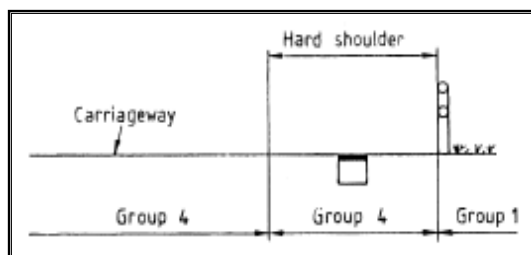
Typical detail of a hard shoulder showing some of the locations of the installation groups (BS EN 124:1994)
